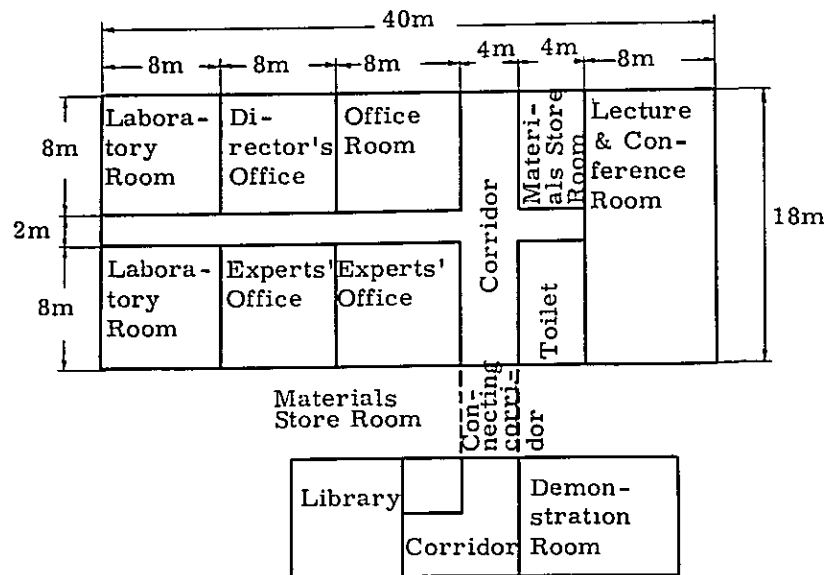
Layout of Office Room, Laboratory, Demonstration Room and Library
